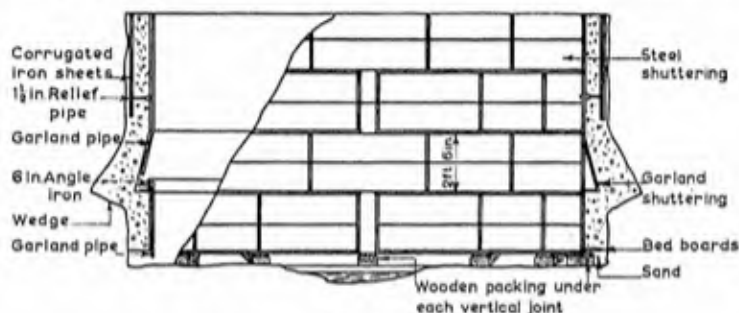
WALLING CRIB AND OUTSIDE GARLAND
